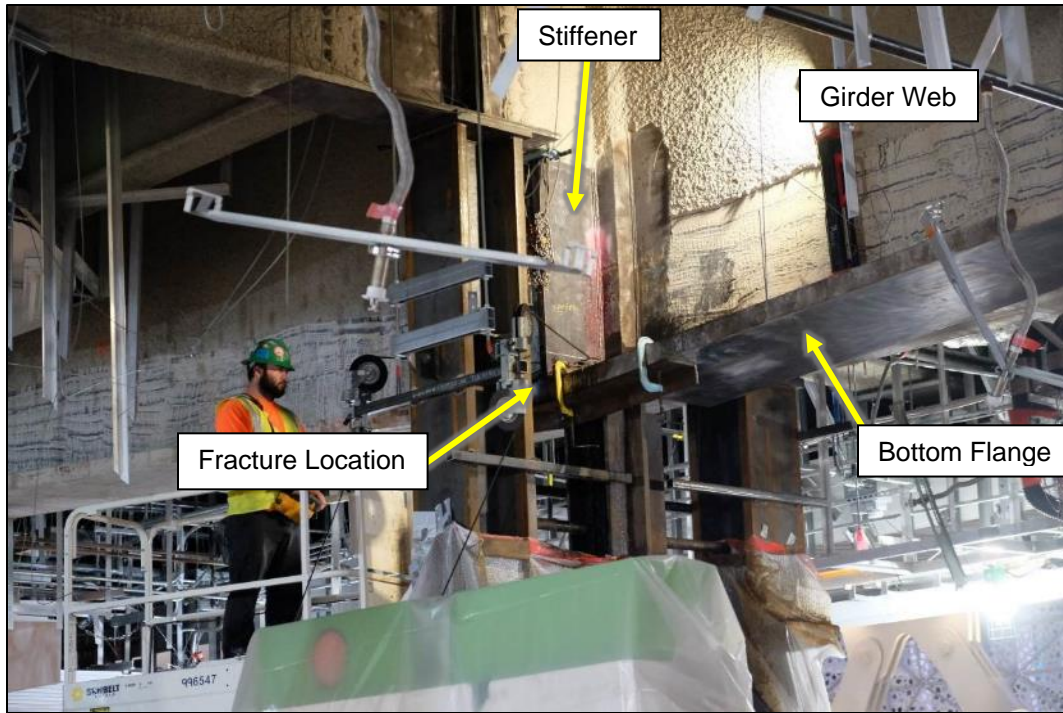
Flange sample removal of the north side girder by wire cutting.
